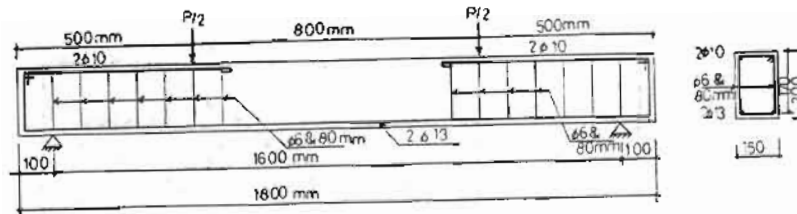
Typical Reinforcement for Investigated Reinforced Concrete Beams.
